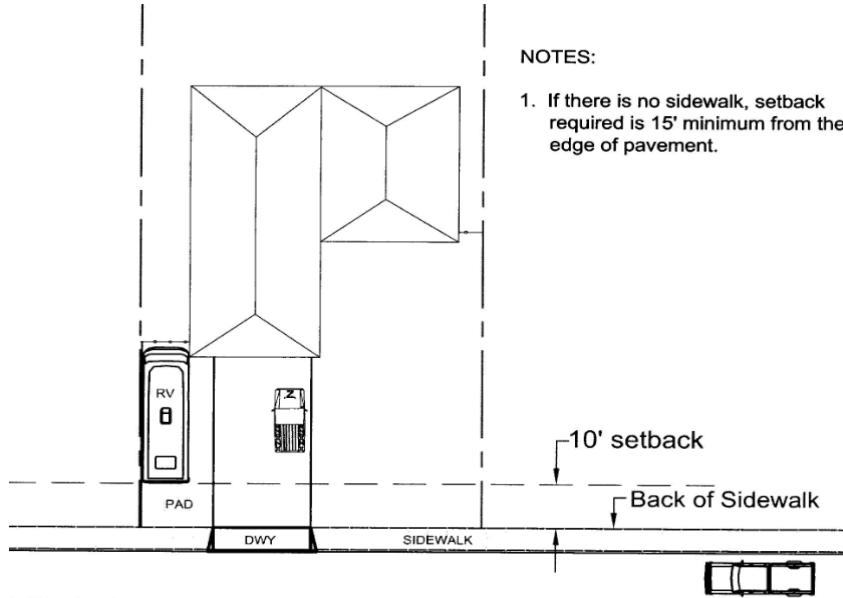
PARKING ADJACENT TO DRIVEWAY
